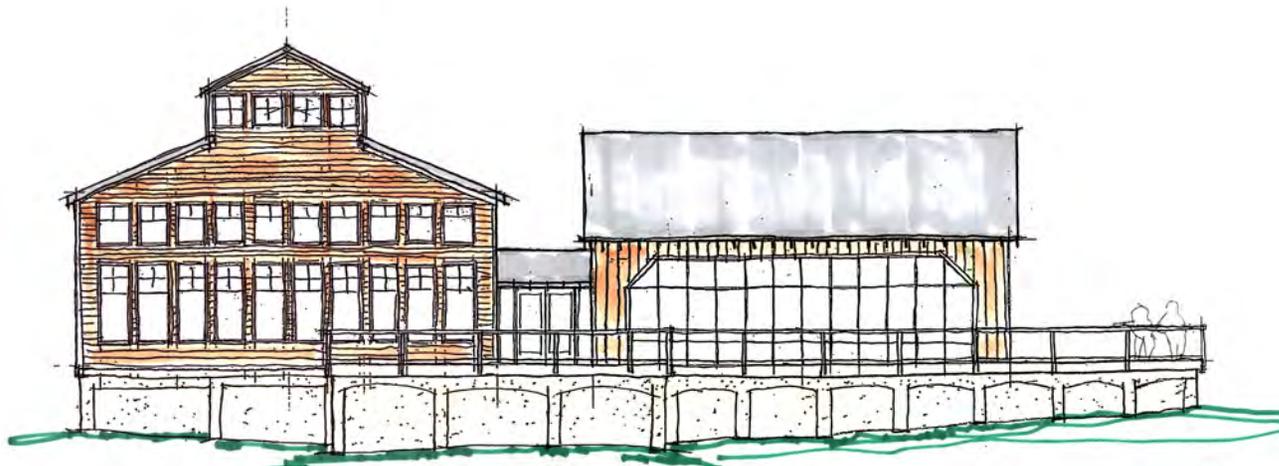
South Elevation of the Restaurant Building facing the Truckee River.
